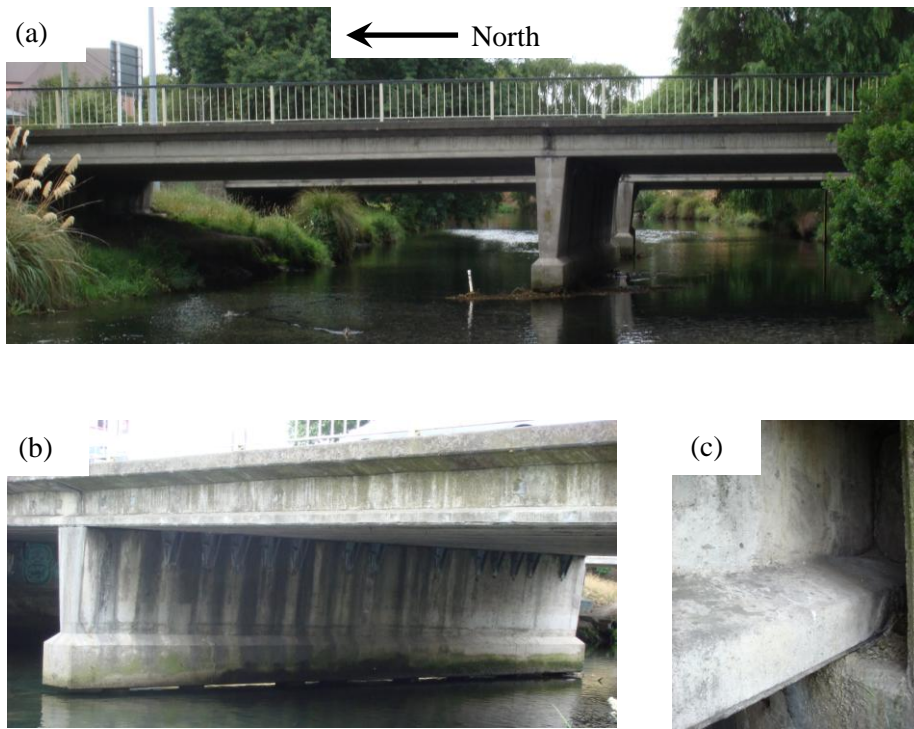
The Fitzgerald Avenue twin bridges: (a) elevation of the west bridge; (b) illustration of the central pier and pile cap; and (c) seating connection of bridge deck on abutments.
